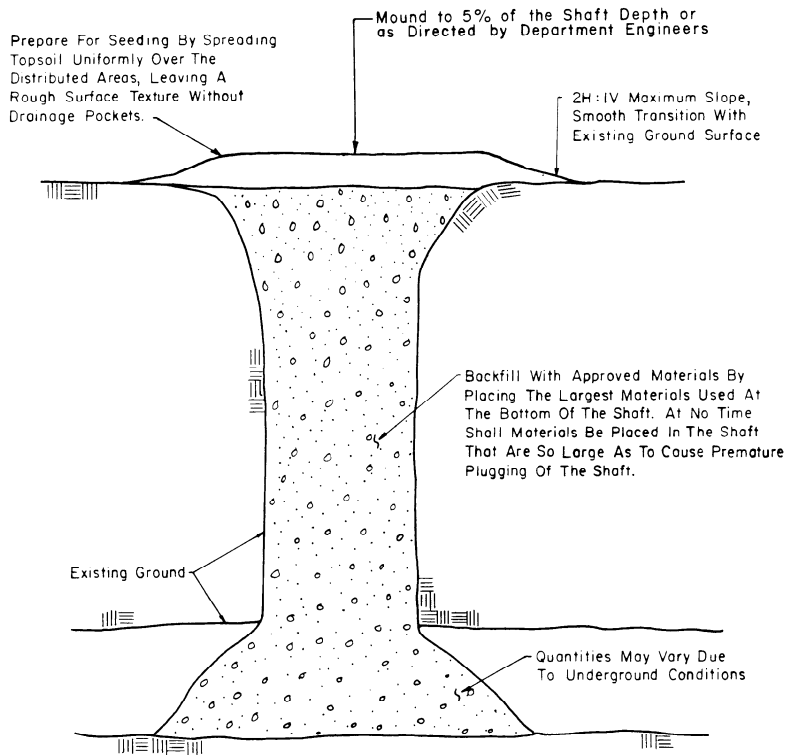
Dry shaft seal (Anon., 1988c).
